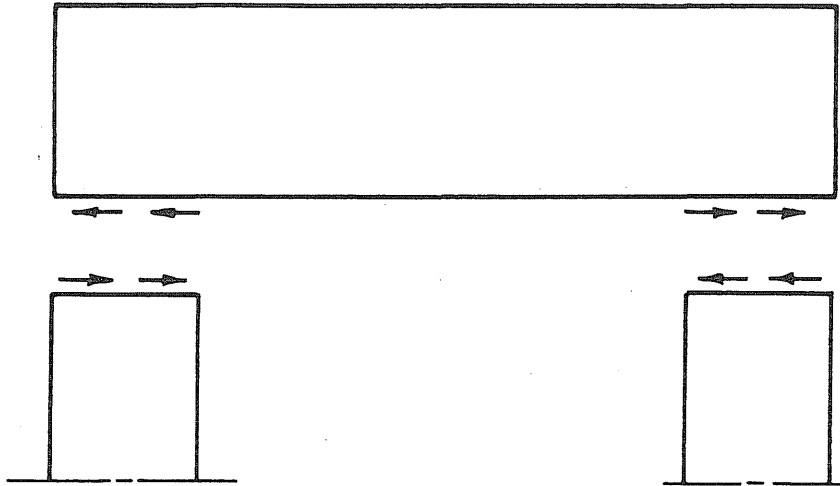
SHEAR STRESSES BETWEEN WALL AND SLAB
